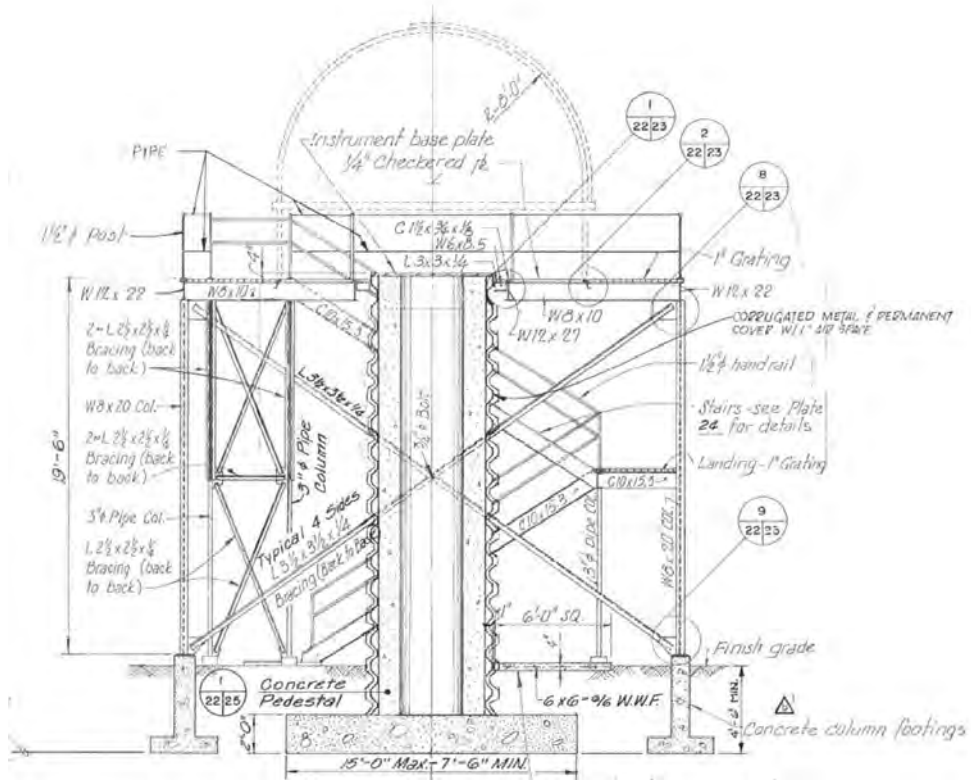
20-foot telescope platform, 1979 (WSMR Drawing set WS-UB).
